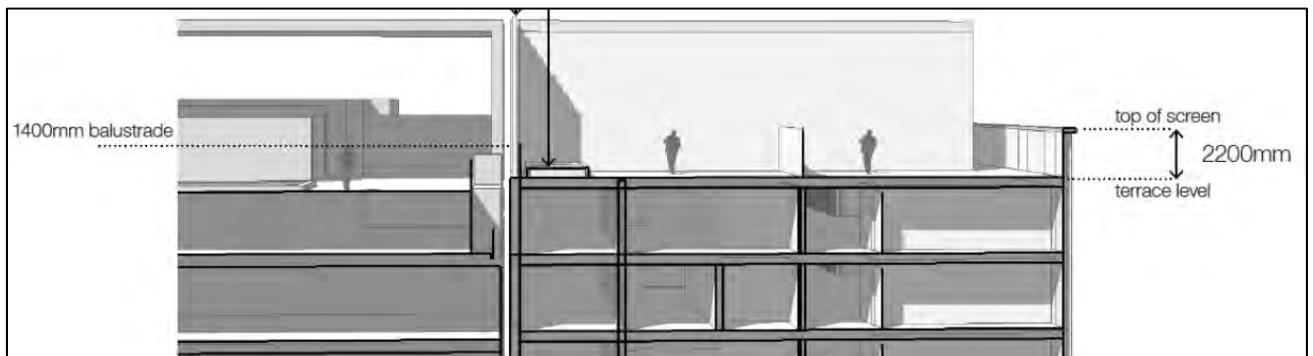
Section drawing illustrating the relationship of the proposed penthouses terraces with that of 'The Hyde' and the indicative 2.2 metre high wind screen
